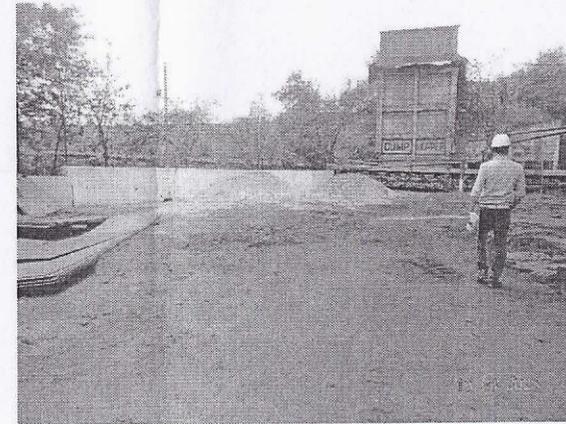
Photo of wall to prevent silt/rejects from washery to Sonadubi river.
